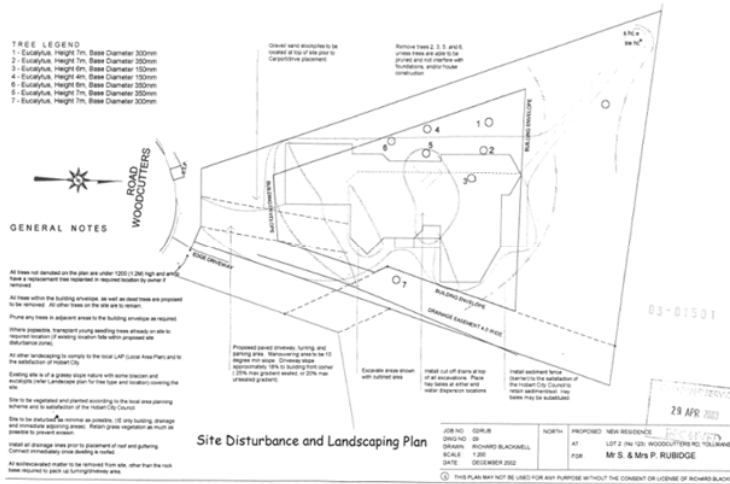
The landscaping and site disturbance plan submitted as part of PLN-03—1501
